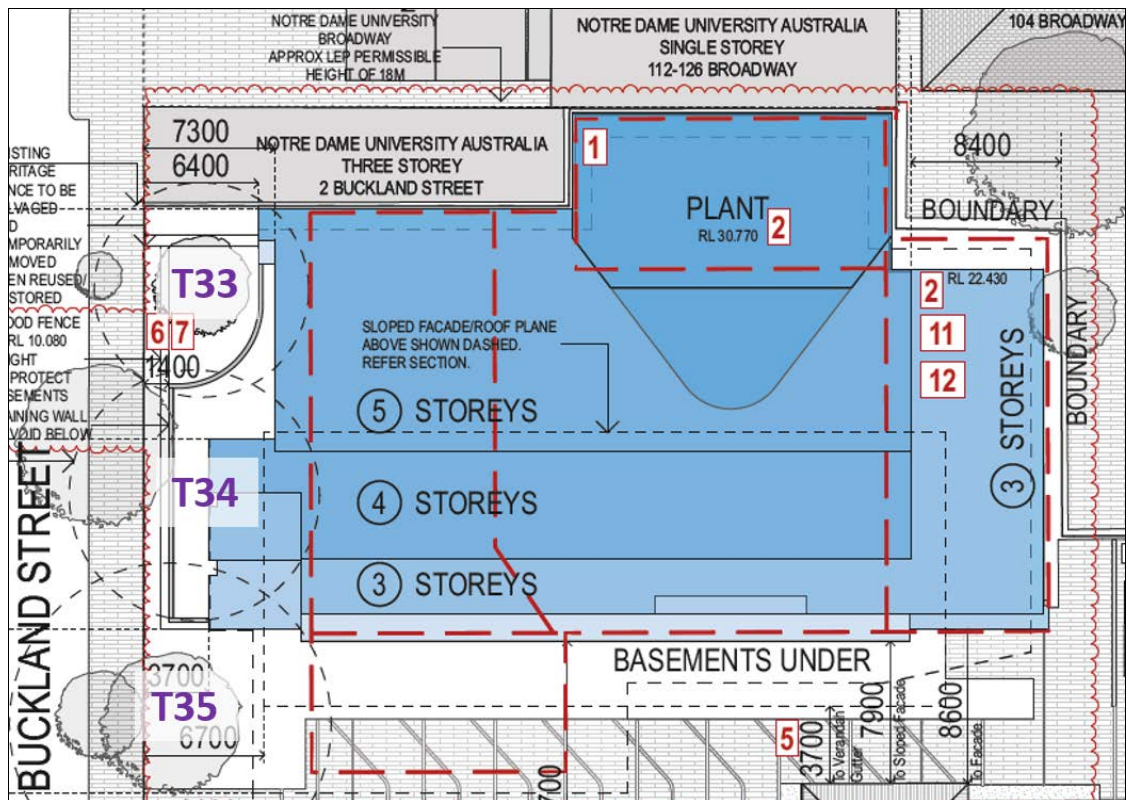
| Location of T33, T34 and T35 and proposed building envelope
